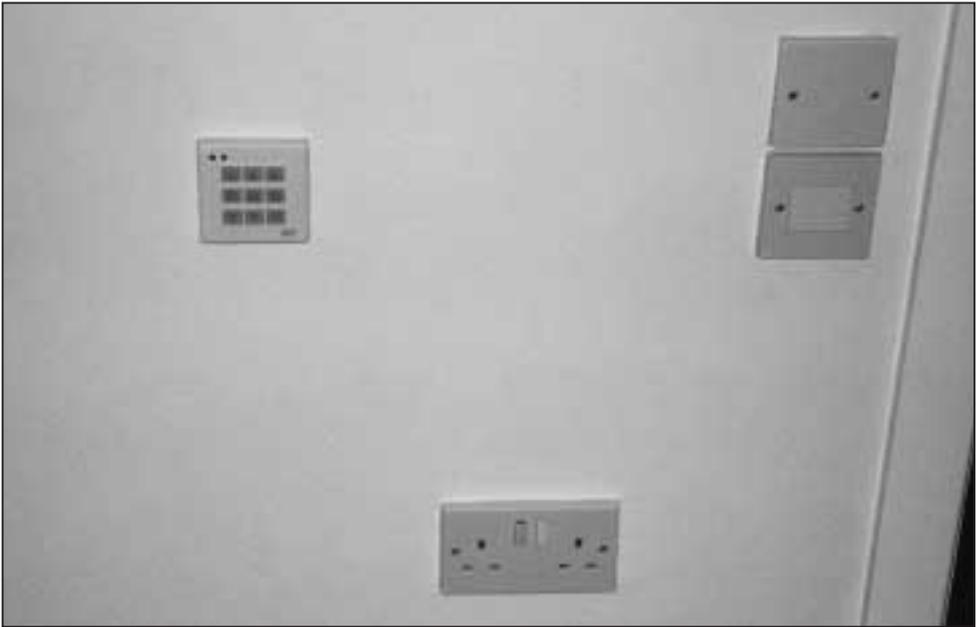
Equipment and facilities installed in Edinburgh – contd.
